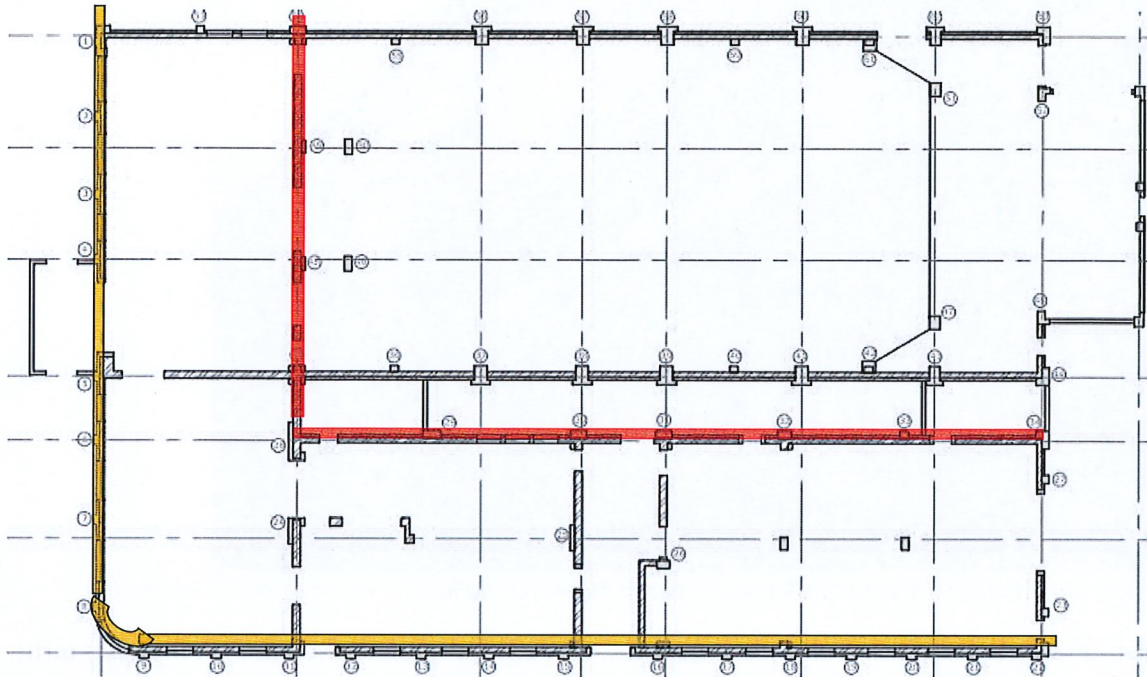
Ground floor plan. Façade concrete highlighted yellow. Rear wall line shown in red.
